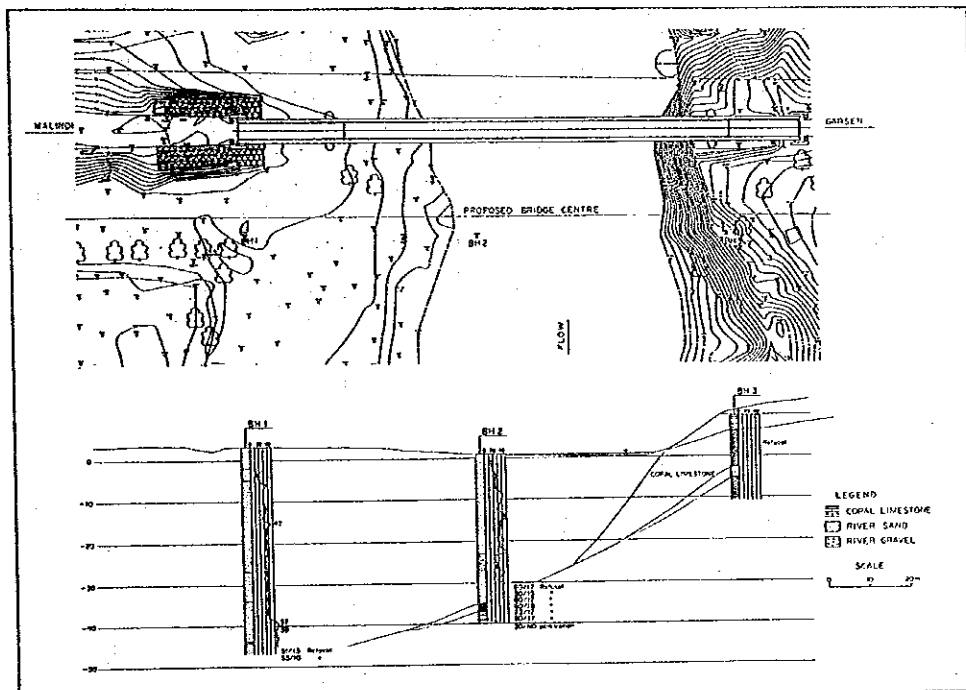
Assumed Subsoil Profile at the Bridge Site
